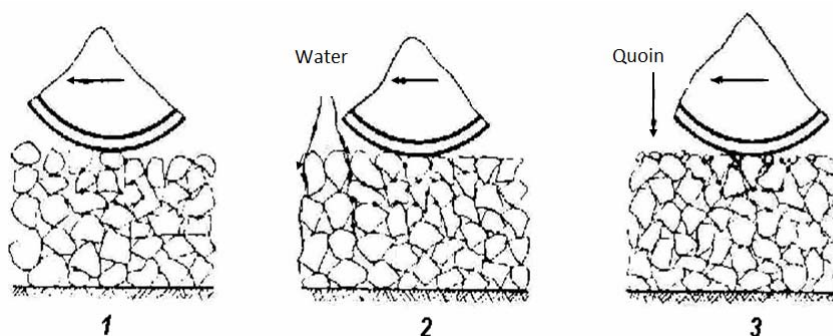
The process seals the top layer macadam: 1 - Compression; 2 - The rolling; 3 - Final seal of bowing
